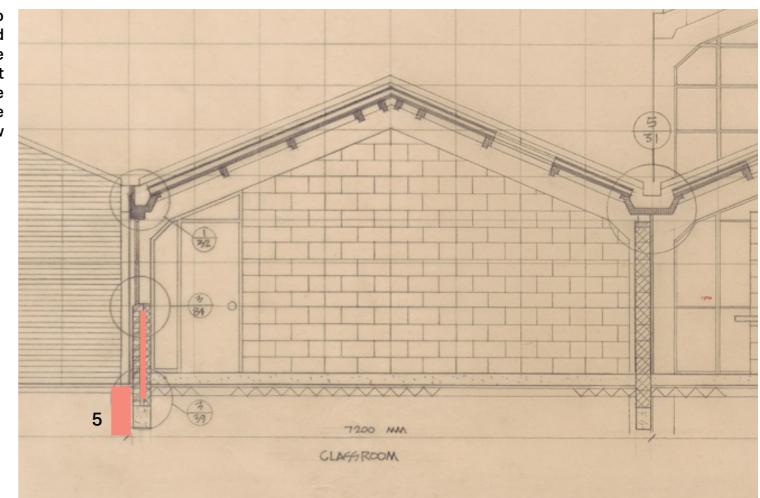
Fig. X Original Archival Section of Gutter and Eaves Detail. by Peter and Mary Doyle Architects, highlighted to indicated location of interventions
